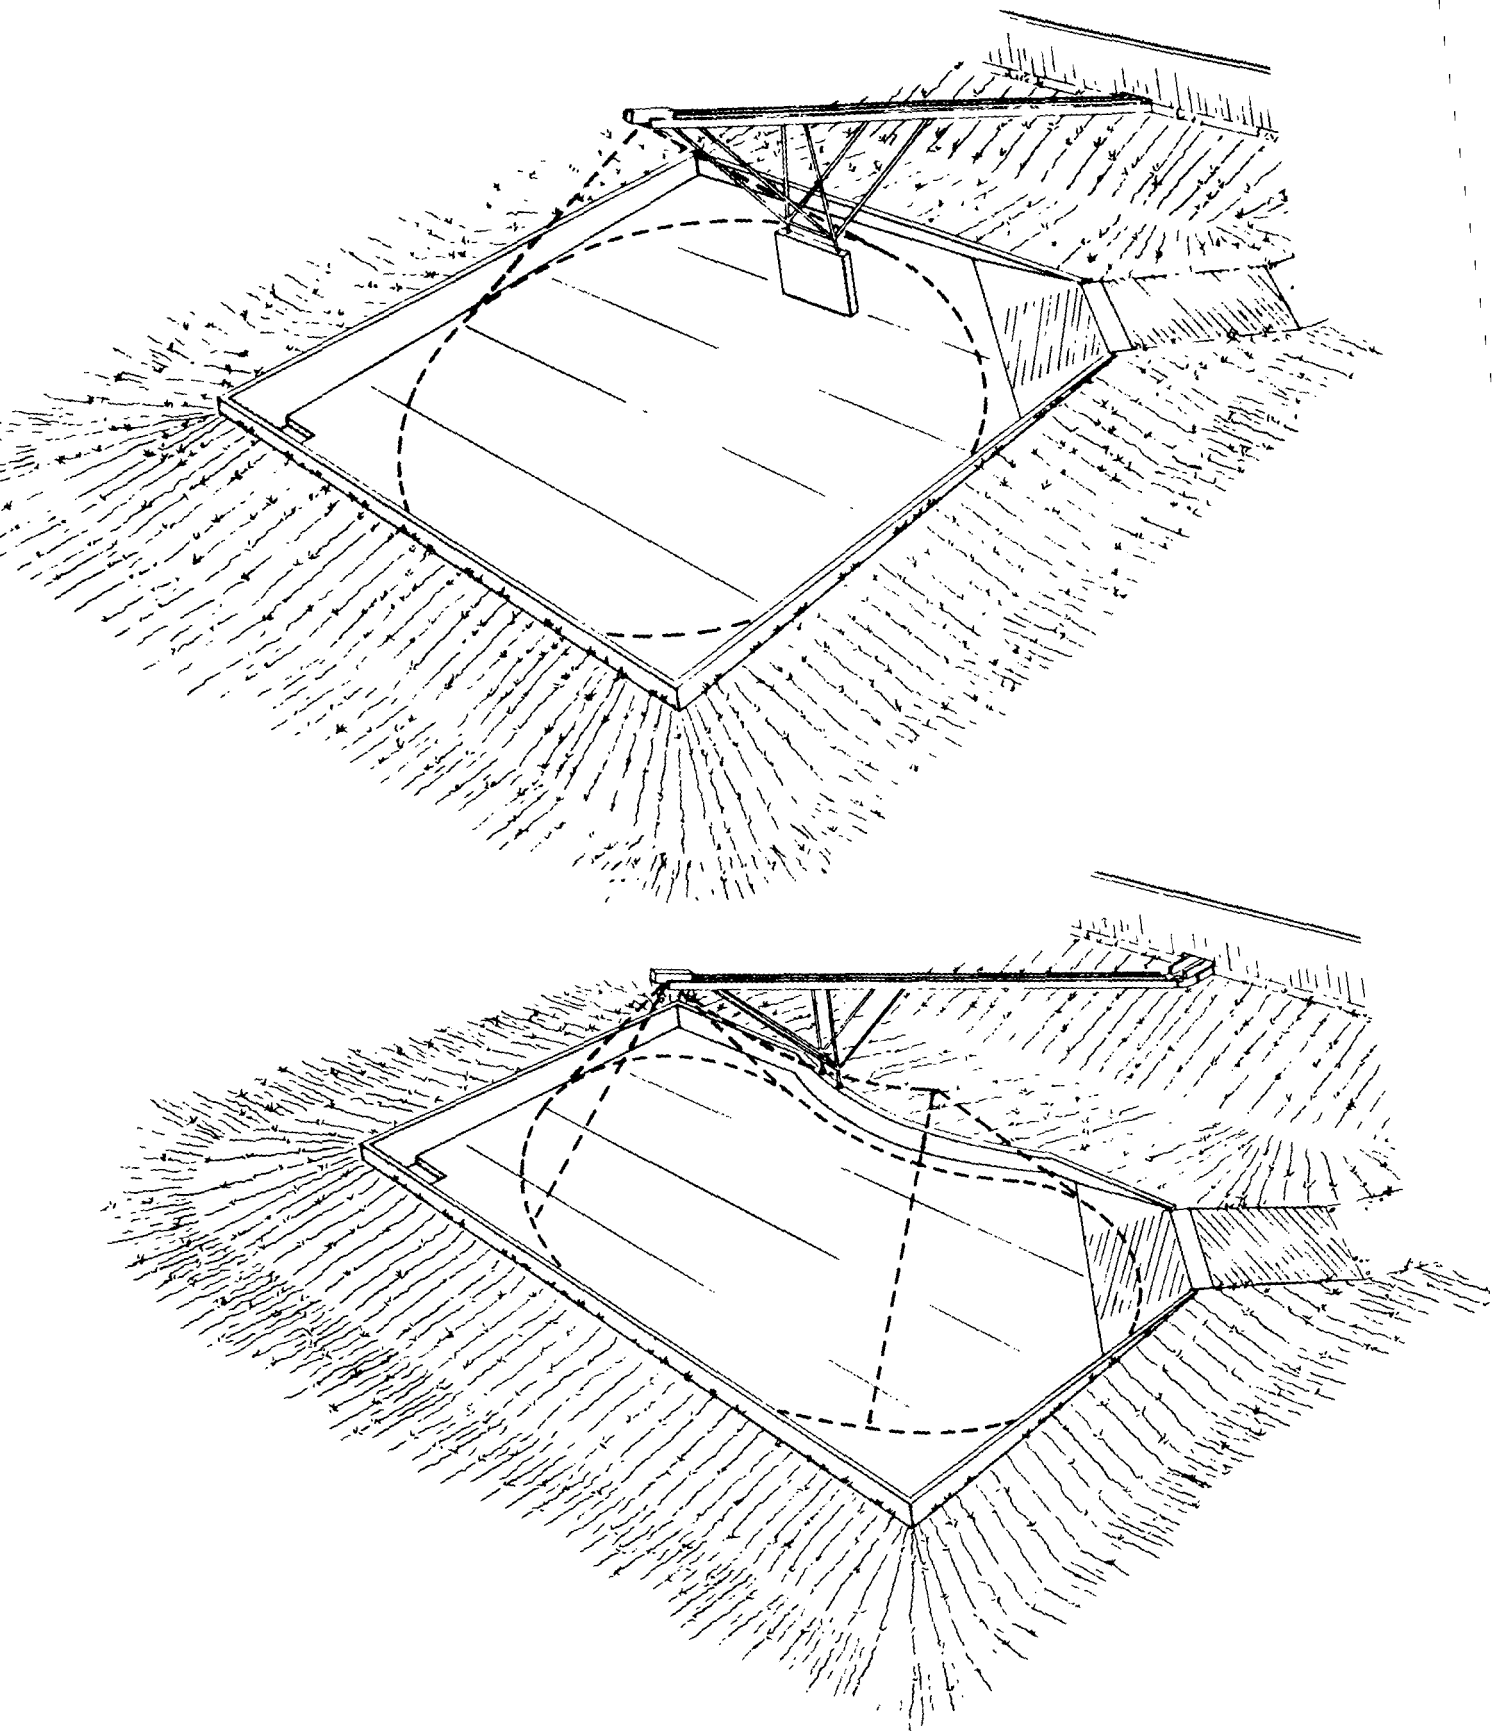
Curbed Storage Slab for Stacked Manure (CPS Plan 2372)
